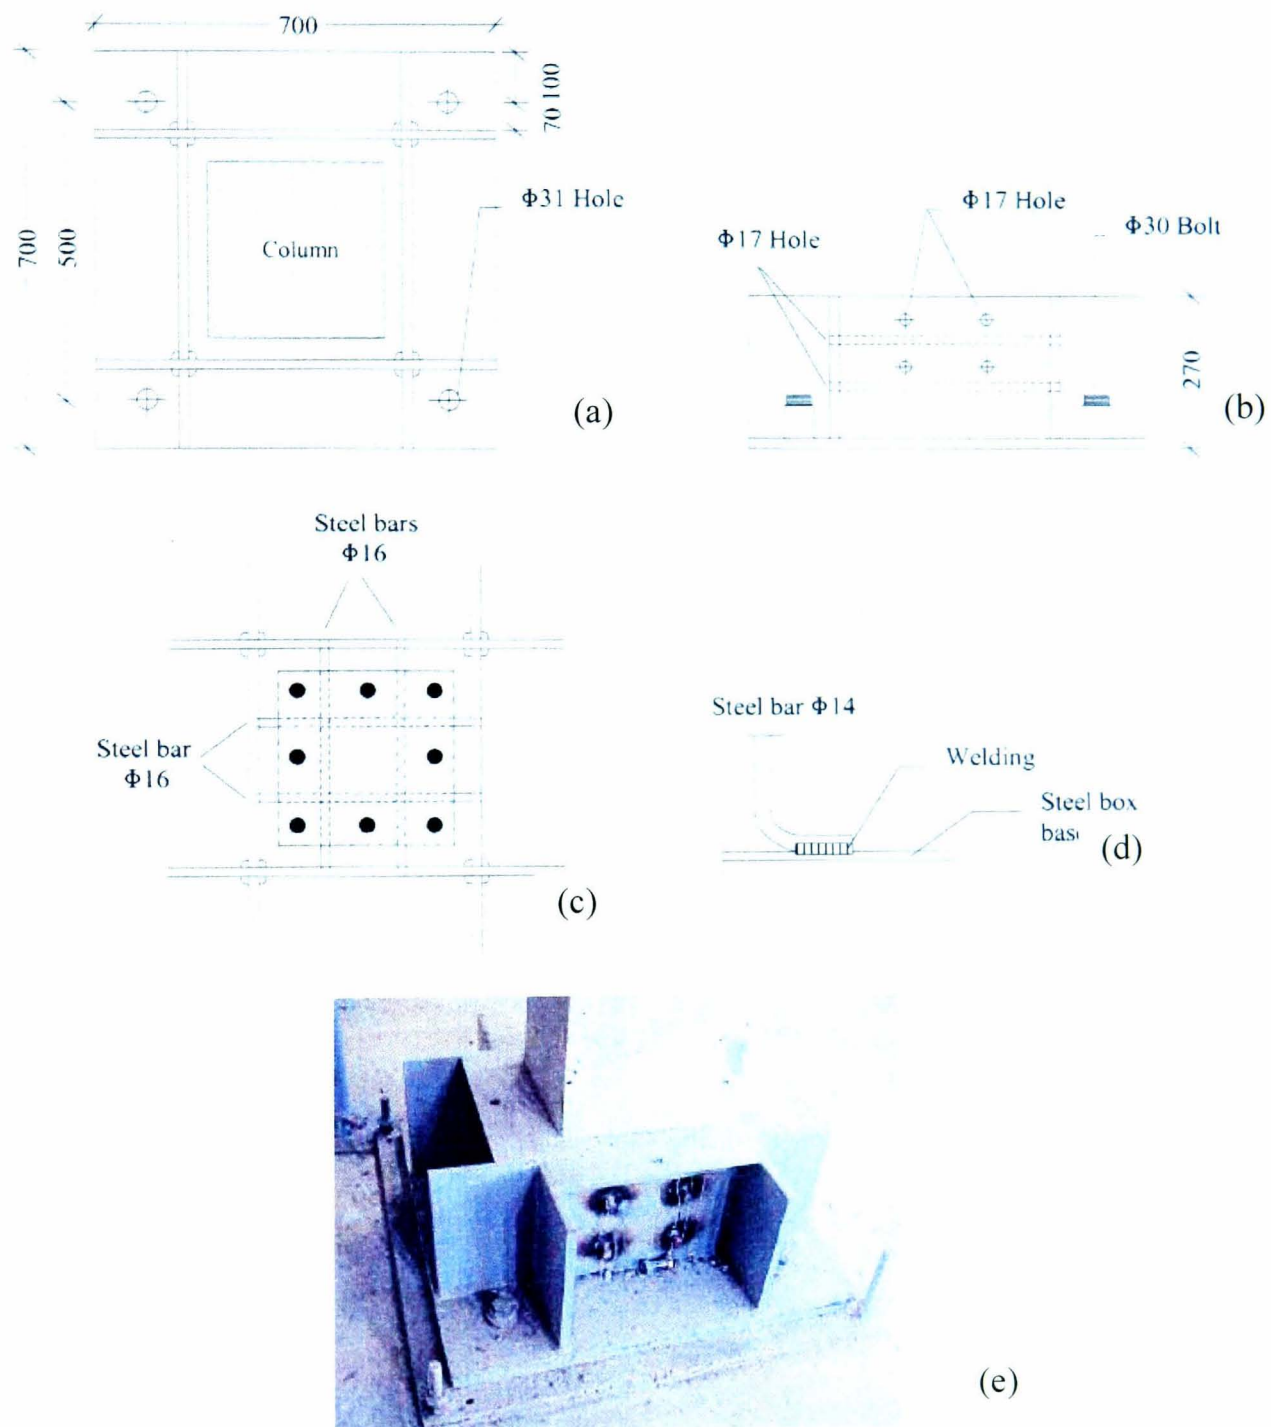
(a-d) reproduced from Chaudat, 2005), a) Plan view of the steel box, b) Side view of the steel box, c) Cross-section of a typical steel box, d) Column bar welding detail into the steel base and e) Isometric view of the foundation (obtained from Chaudat, 2005).
